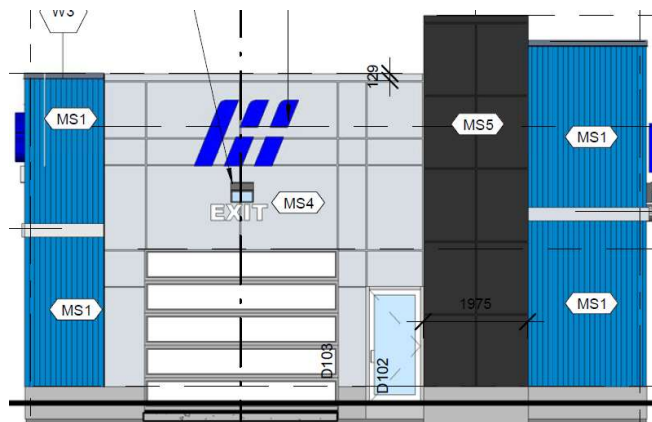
Exhibit N: East Elevation of the Building showing the exit from the car wash tunnel, the vertical projections on the east façade and the corporate logo
